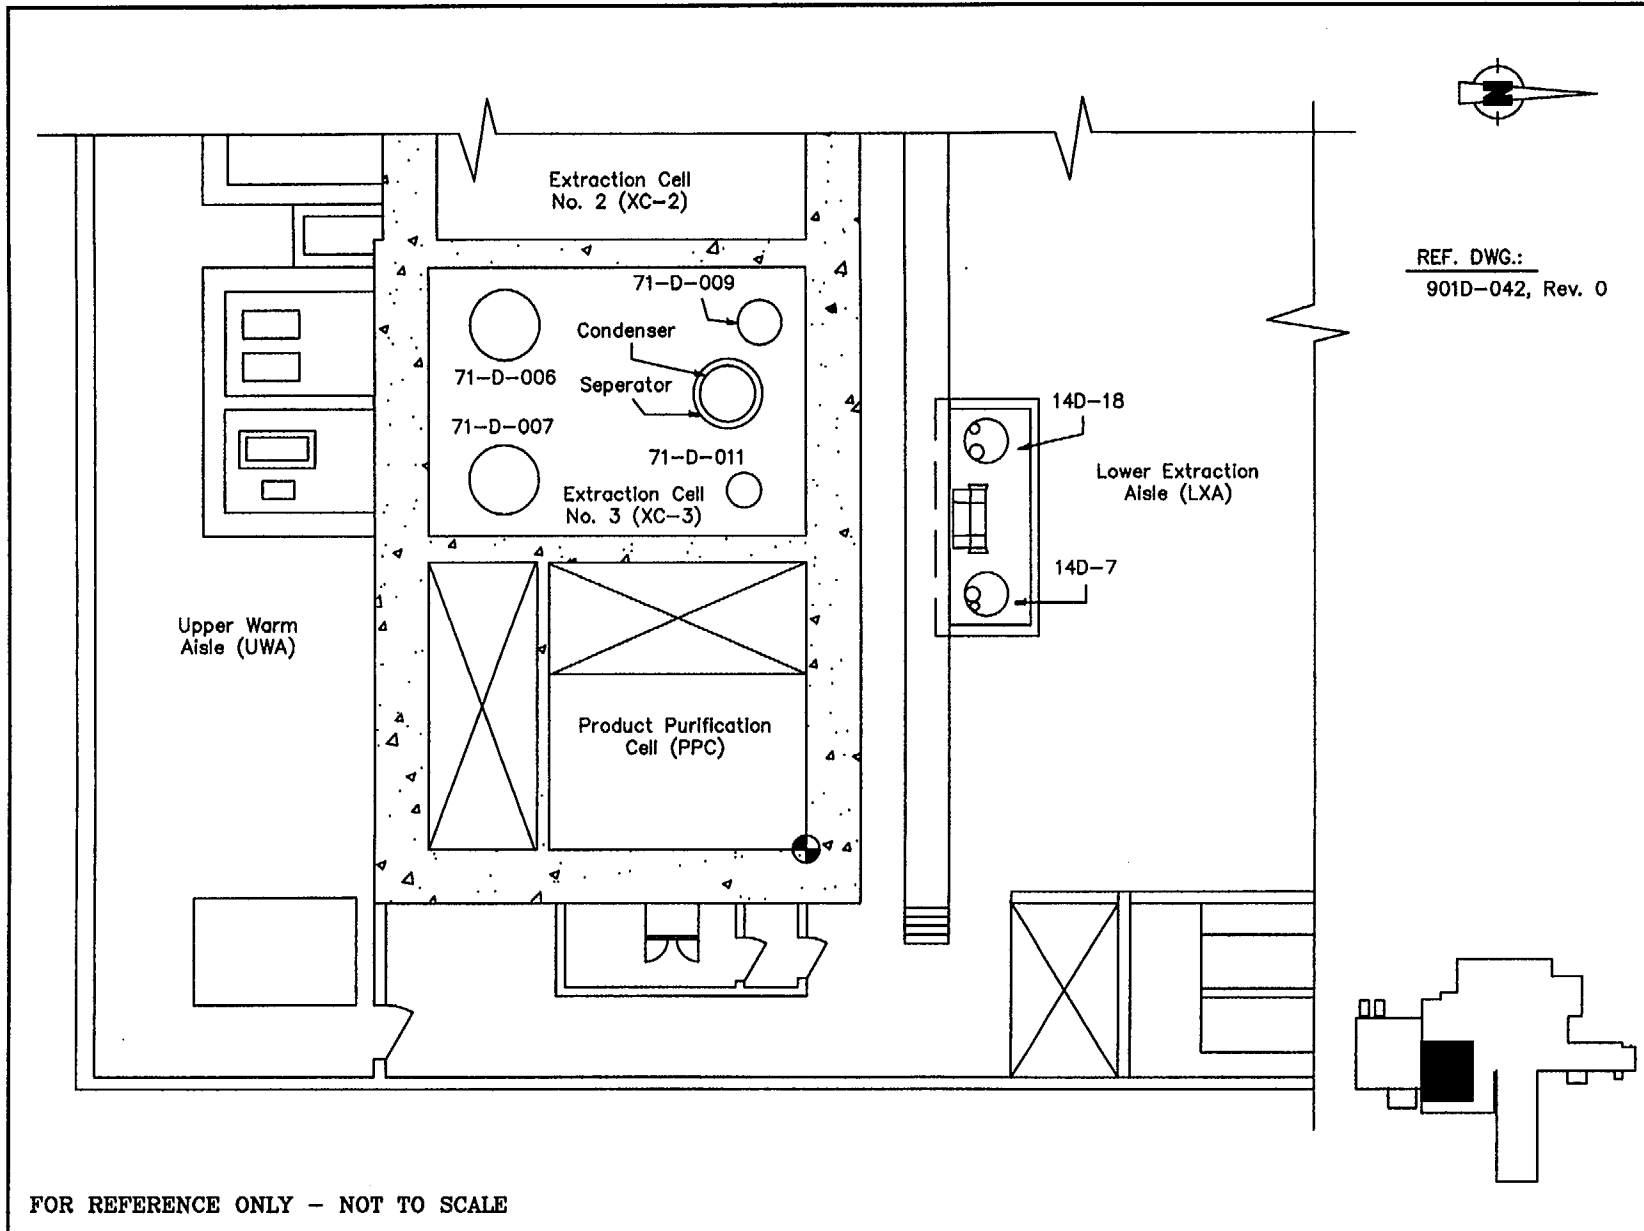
LWTS Plan at Elevation 114.5'
